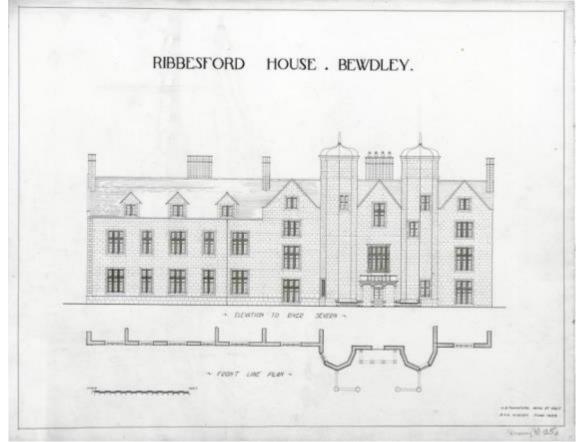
Elevation and partial plan of the house, 1933 (B&FCAA 2018)
